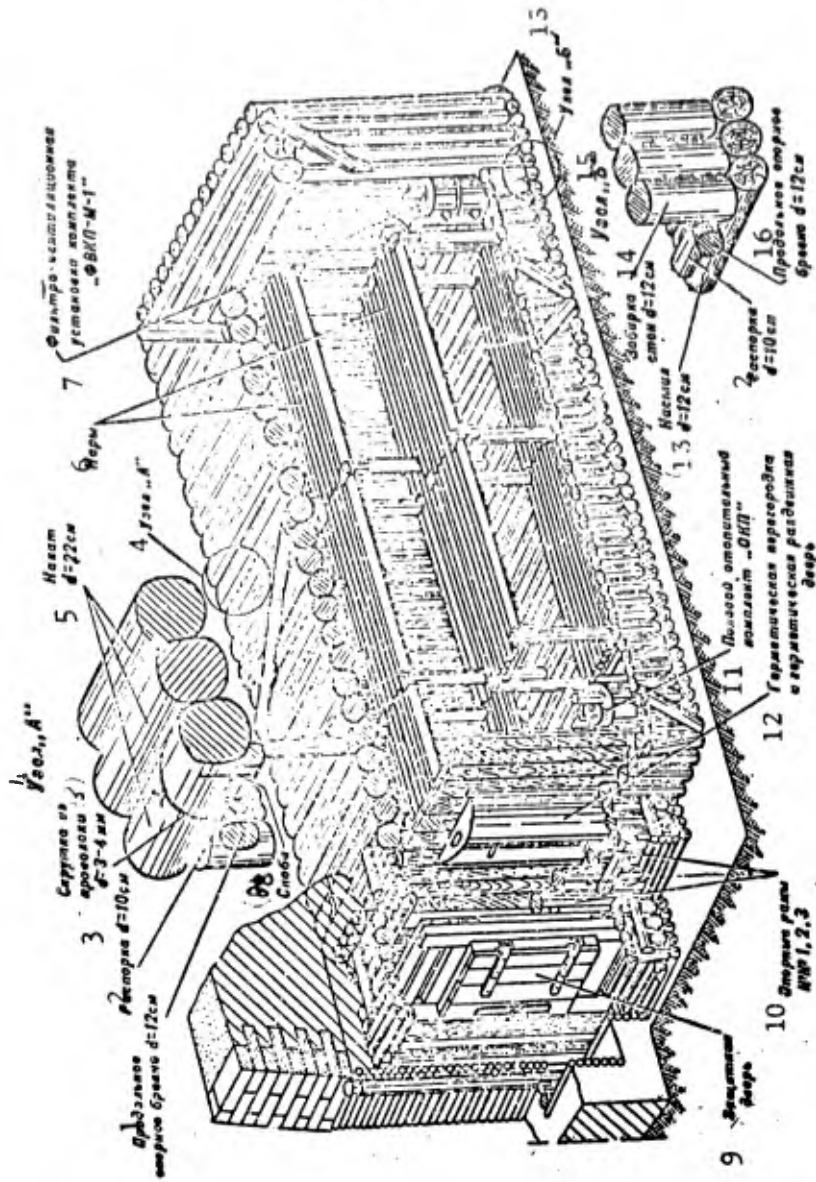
Light-Type Shelter of Notchless Construction (General view). Key: 1, Longitudinal supporting log; 2, Bracing; 3, Twist joint of wire; 4, Detail A; 5, Flat wooden roofing; 6, Plank bed; 7, Filtration-ventilation unit of FVKP-M-1 outfit; 8, Bracket; 9, Protective door; 10, Supporting frames; 11, OKP field heating unit; 12, Bracing; 13, Flooring; 14, Wall prop; 15, Unit B; 16, Longitudinal supporting log.
